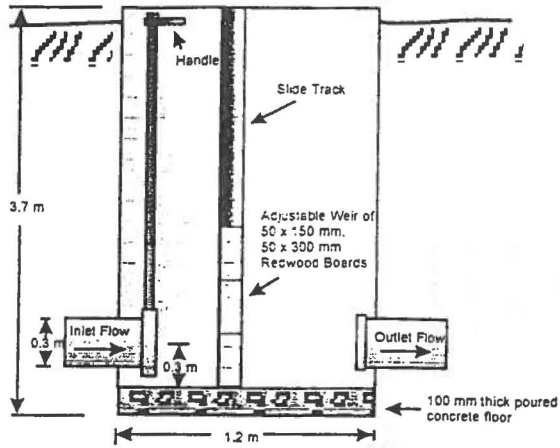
Schematic drawing of manhole and weir structure used on Broadview Shallow Ground Water Management Demonstration Project.
